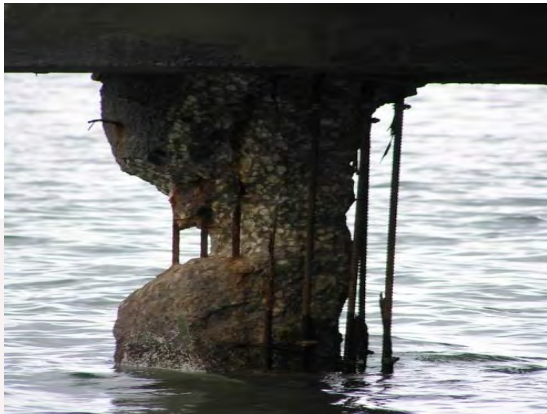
Aggressive corrosion on concrete piles at the tidal zone
